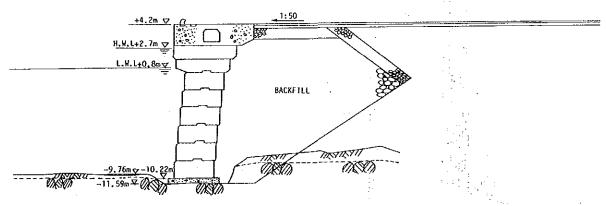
(3) Existing Quay Wall (Berth No.3-8, No.11)
